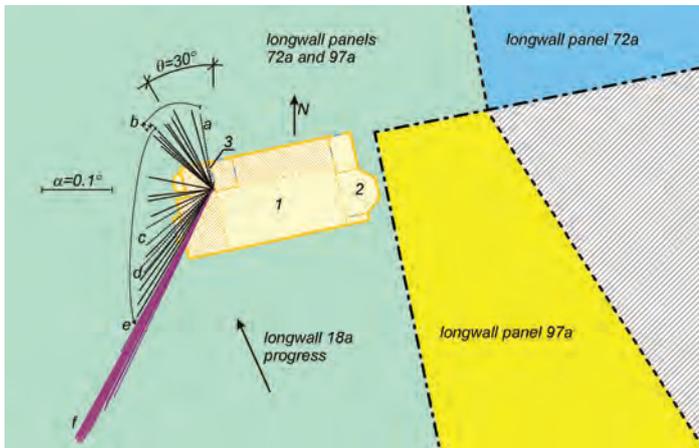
Plan of the church building and its location with respect to longwall panels, variations of the inclination of the church tower: 1 – main aisle, 2 – presbytery, 3 – church tower
